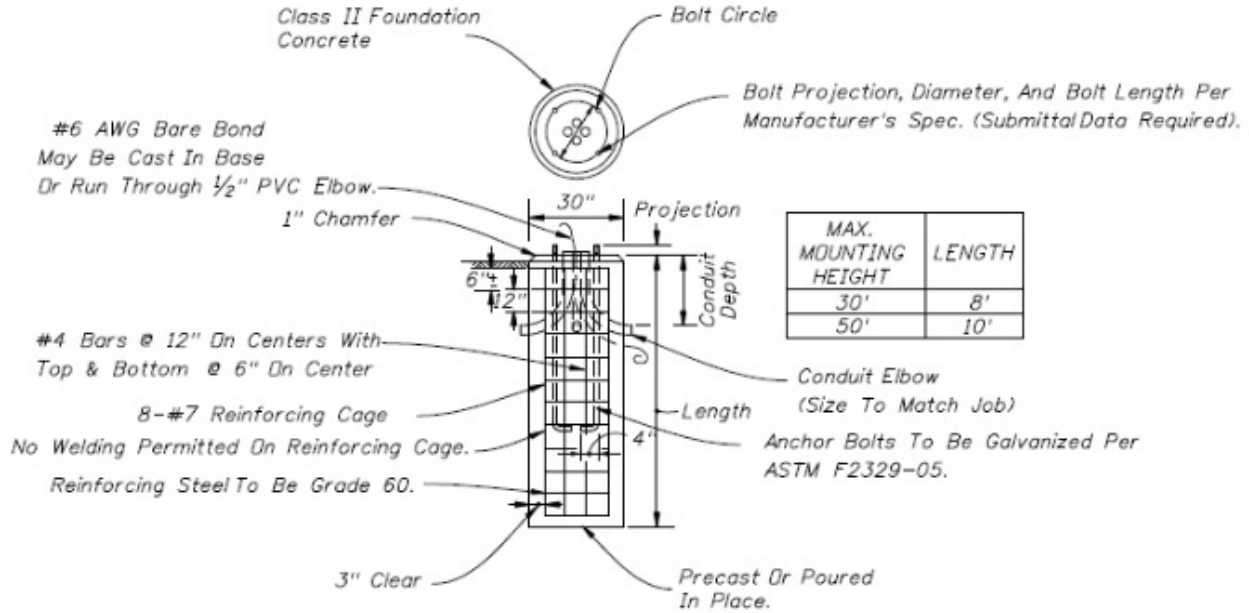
Florida Department of Transportation Auger Drilled Pole Foundation
